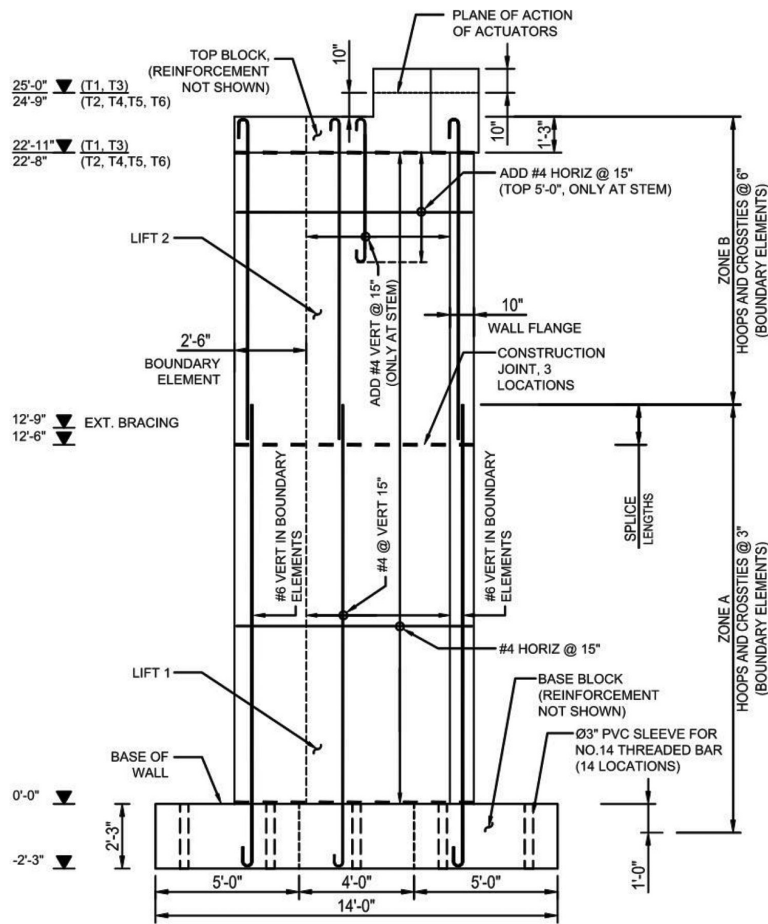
Typical wall elevation and reinforcement layout. (Note: 1 in. = 25.4 mm.)
